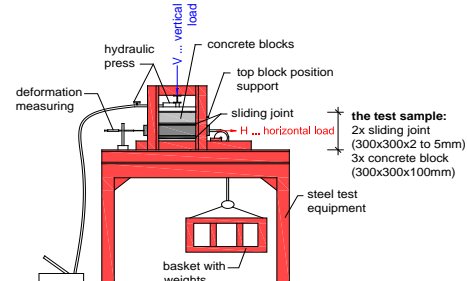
FIGURE II. THE TEST SAMPLE AND THE STEEL TEST EQUIPMENT.
